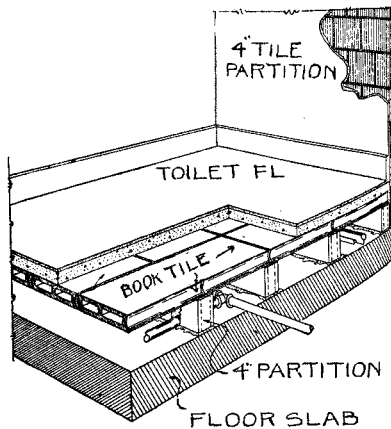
Book tile used for a raised floor (from Cosgrove, *Hollow Tile Construction*, 76).
